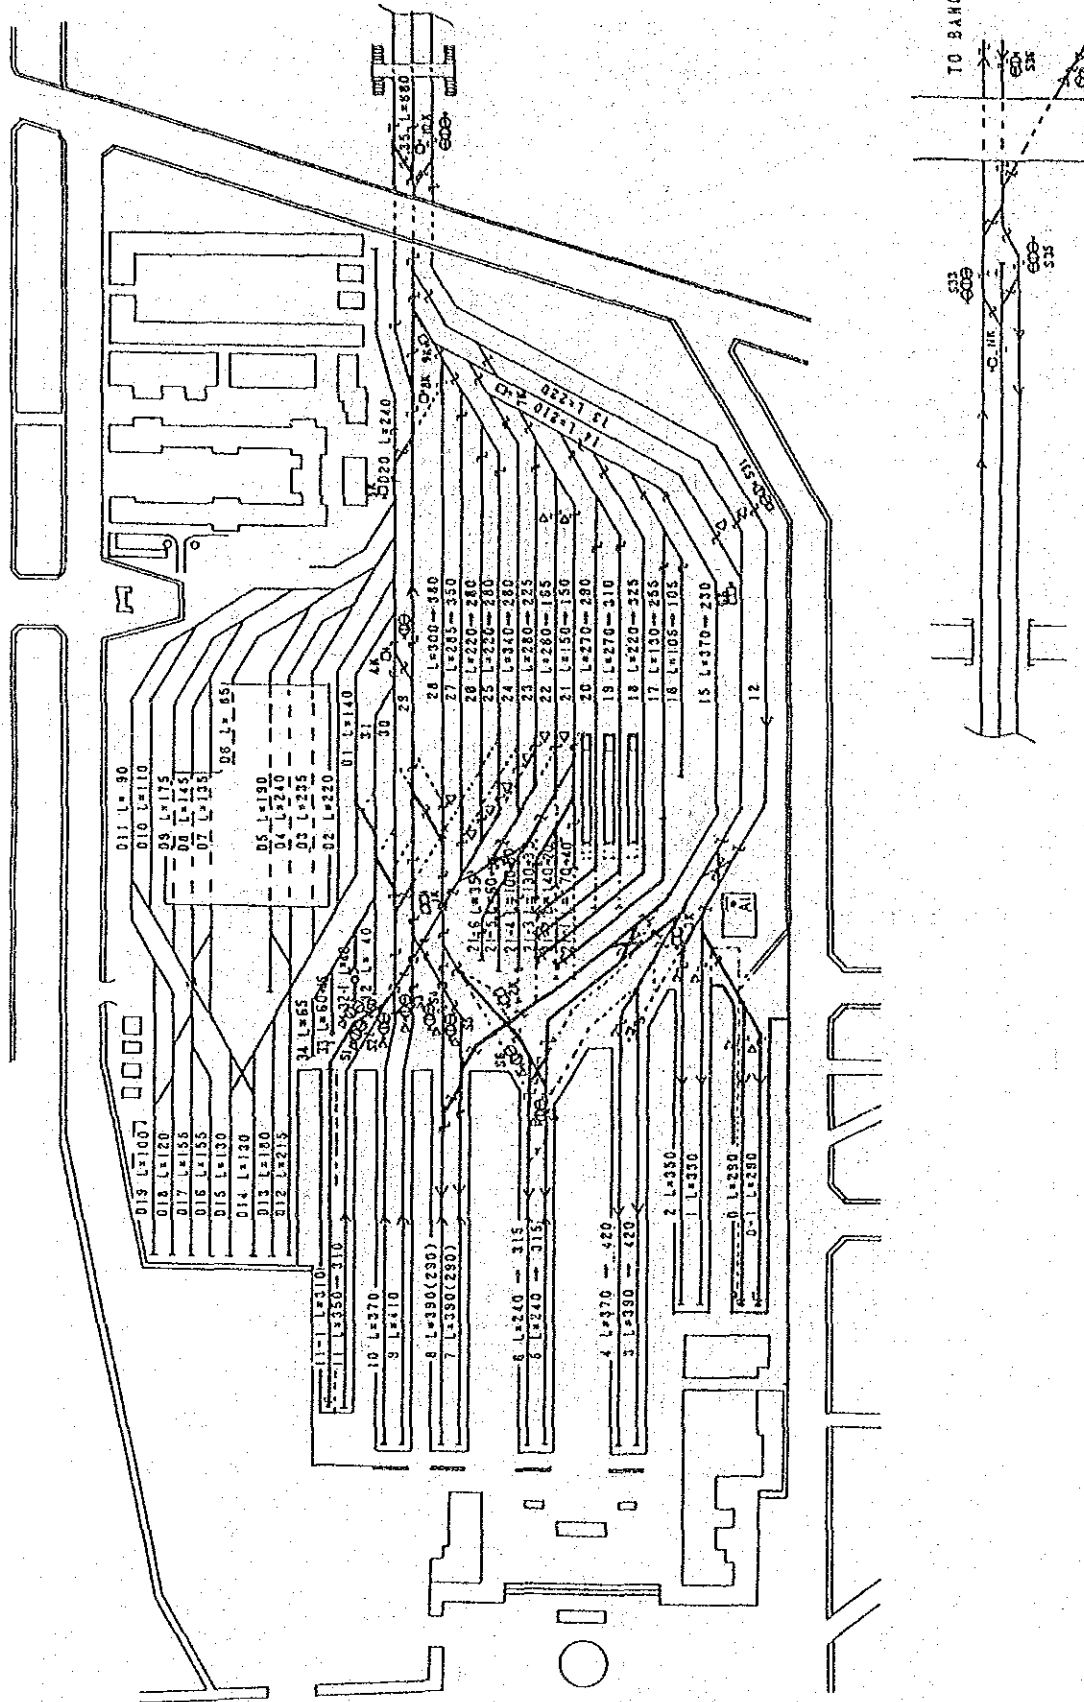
Future Signalling Facilities at Bangkok Station (F/S Plan)
